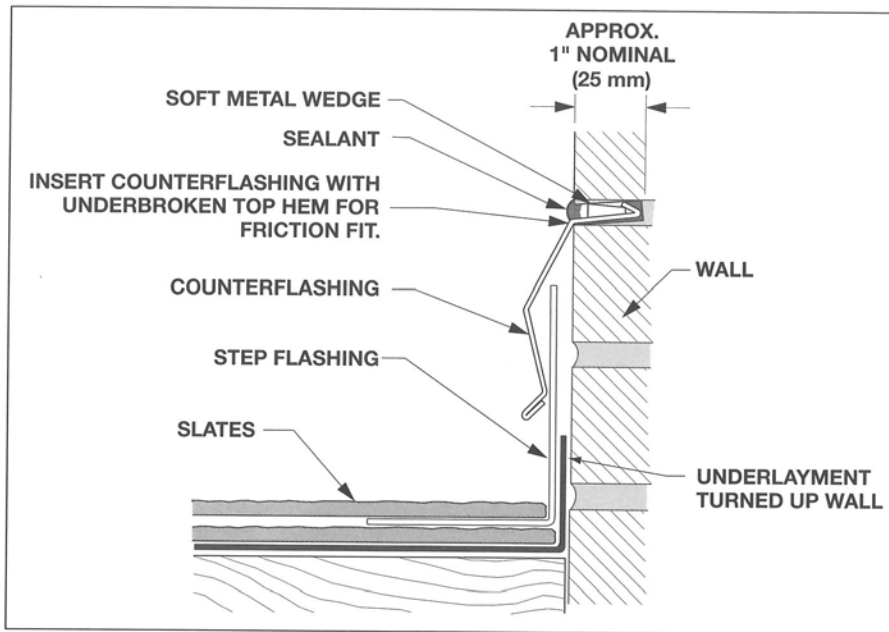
Example of a metal counterflashing inset in masonry mortar joint
